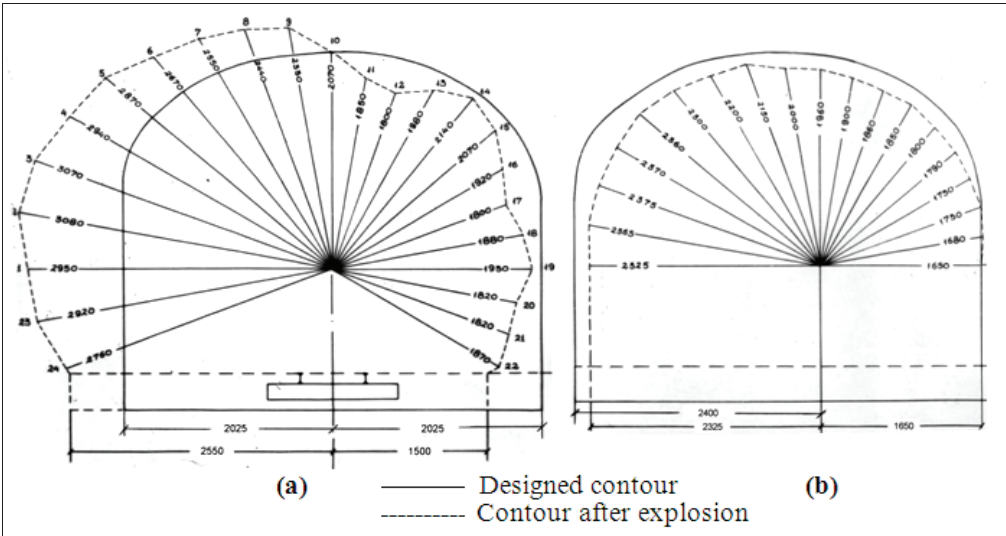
View of cross sections: (a) usual blasting and (b) smooth blasting.
